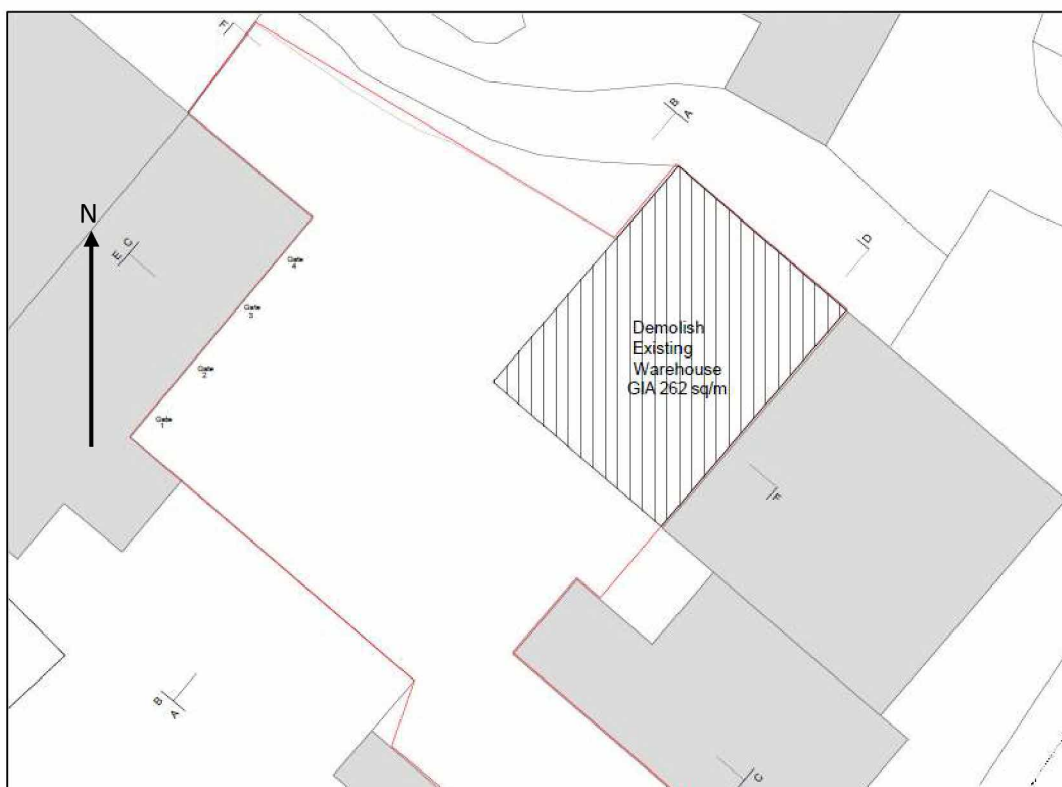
Existing site is outlined in red and the warehouse to be demolished.
